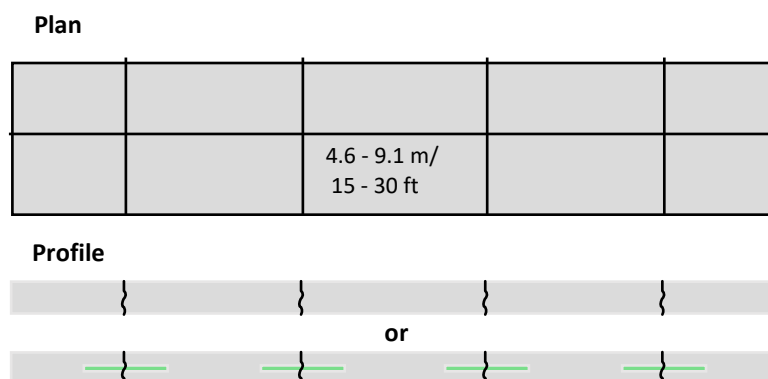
Jointed Plain Concrete Pavement (JPCP) plan and profile
